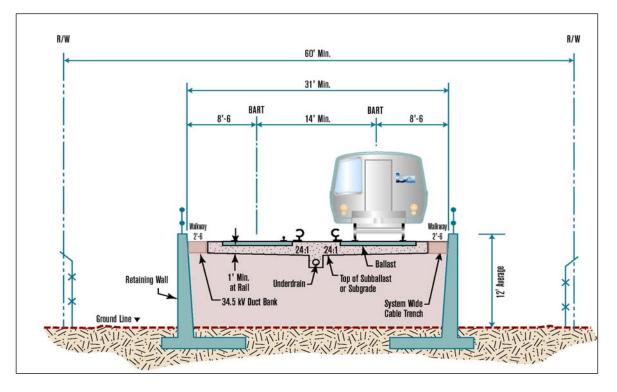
Conceptual Retained Fill Cross Section for BART Alternative
